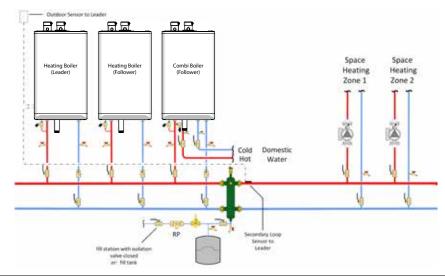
Typical Heating Boiler cascade piping – concept drawing. This drawing is only a simple schematic guide
